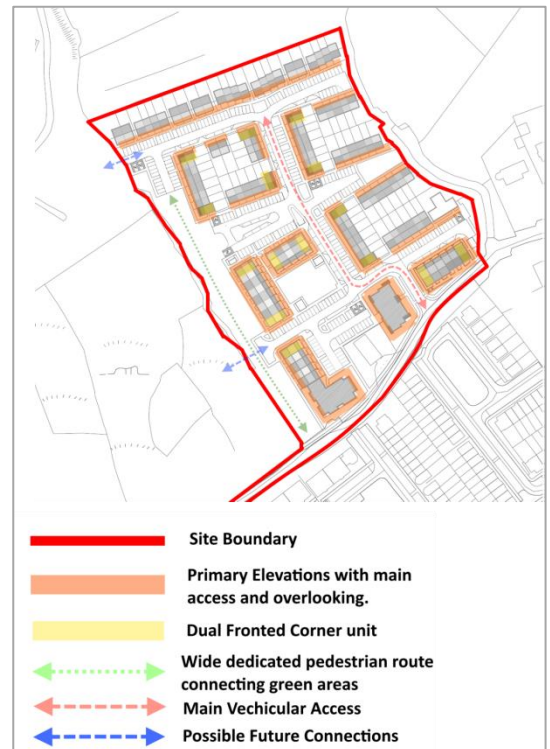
Site Concept & Design Strategy Graphic extracted from -ONOM's Architectural Design Statement
